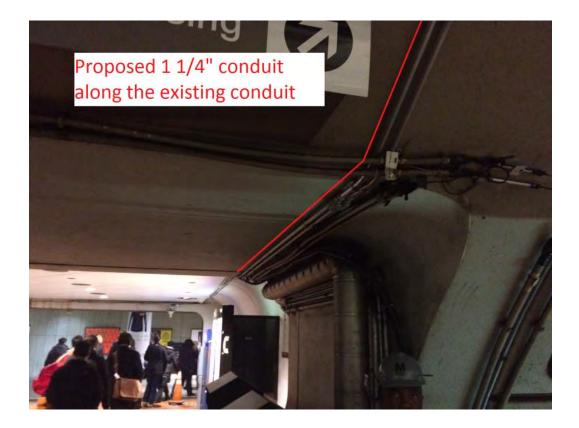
Proposed overhead conduit run from Kiosk to AFC Panel (continued)
